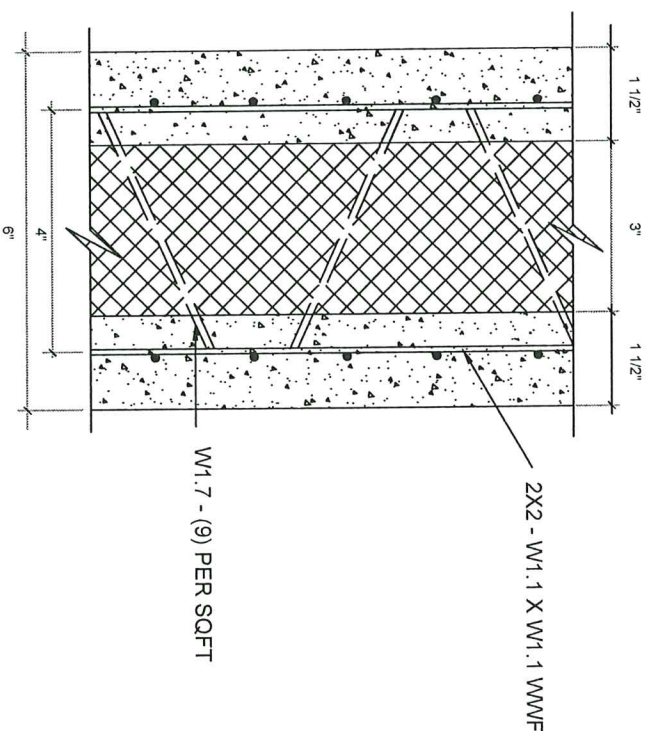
MINIMUM RSG 3-D STRUCTURAL PANEL SECTION
